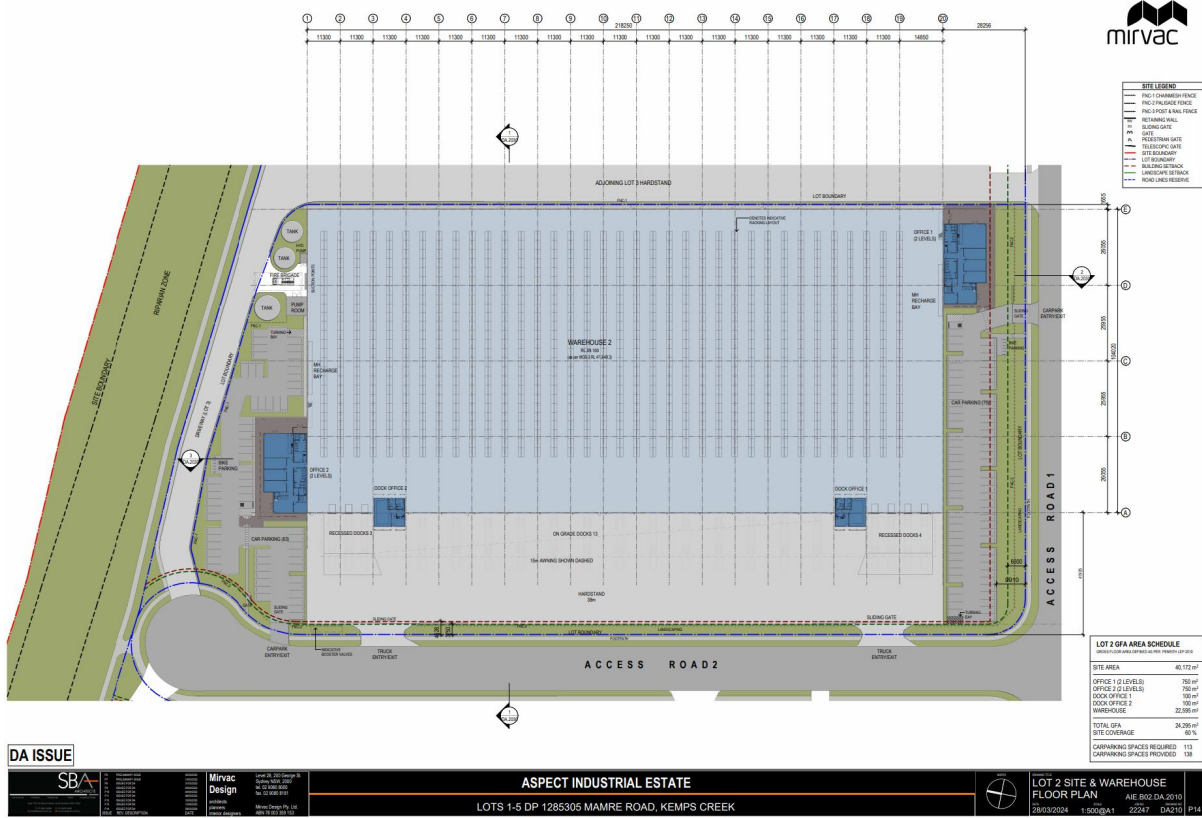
Site Plan – Lot 2 Warehouse as per SSD 58257960
